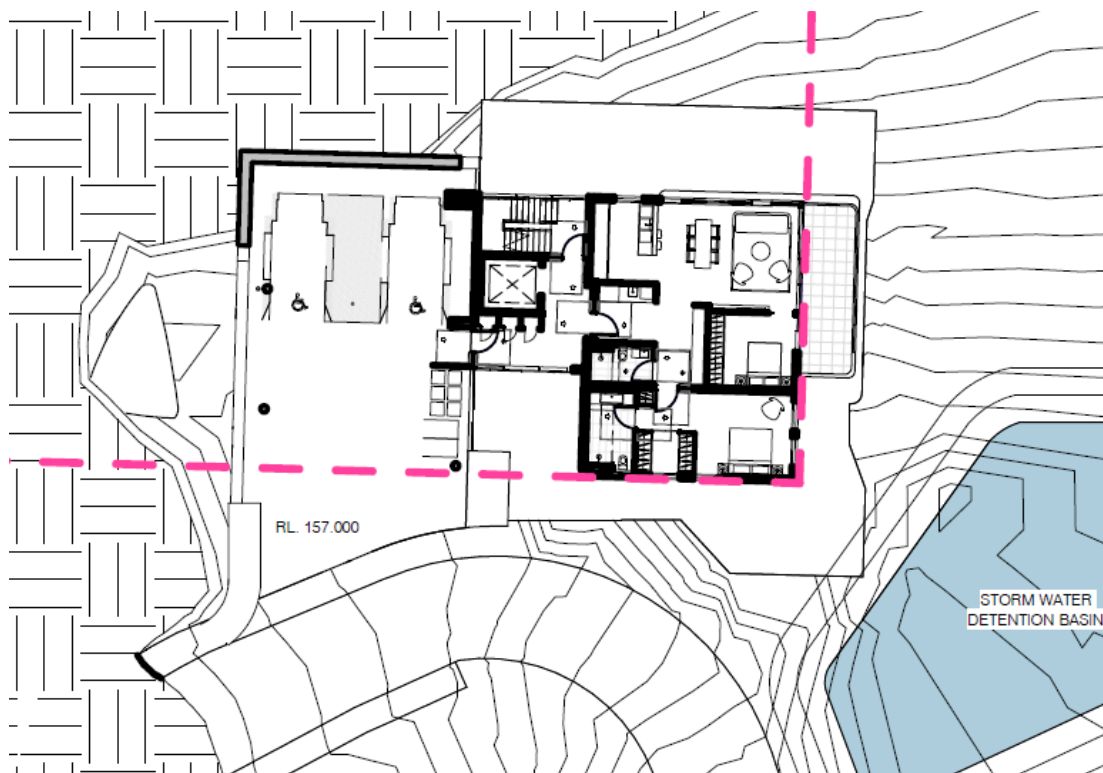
Building D footprint with associated retaining walls as proposed in original DA
